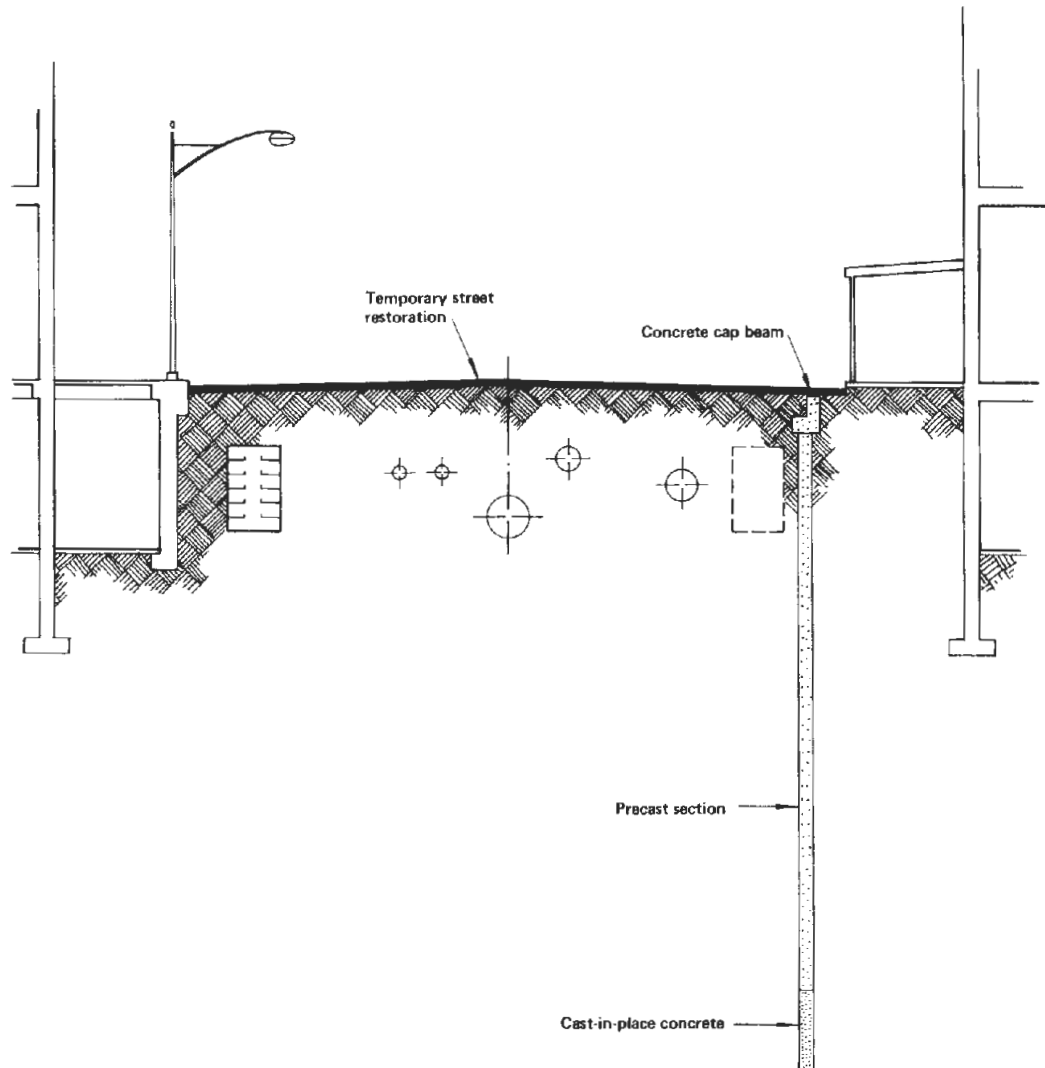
Step 7: Cast cap beam on vertical element and restore traffic.
